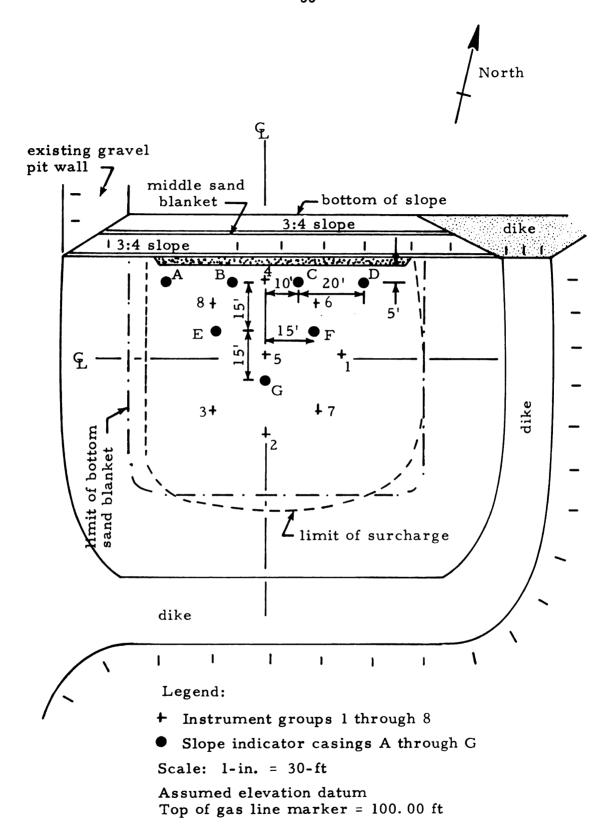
Slope indicator casing locations, A through G, and 3:4 slope, plan view.
